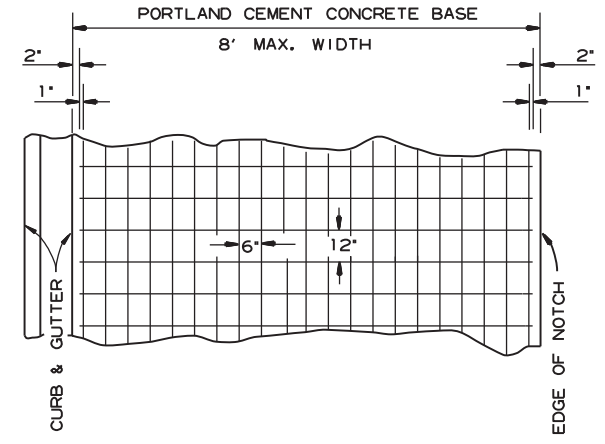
DETAIL OF TURNOUTS, ASPHALT STREETS,
